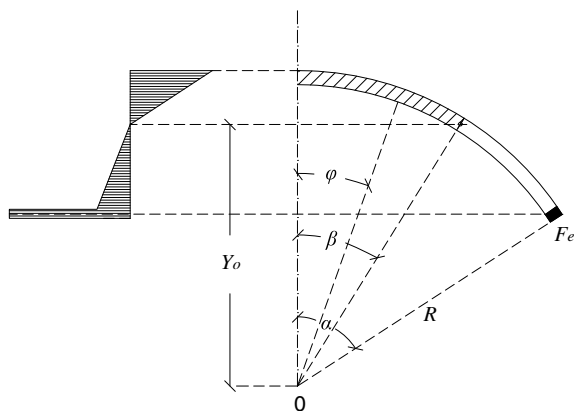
Diagram of stresses in a long cylindrical shell. Diagram of similarity between a reinforced concrete beam and a long cylindrical shell. (Adapted from [Gilman 1938](#).)
